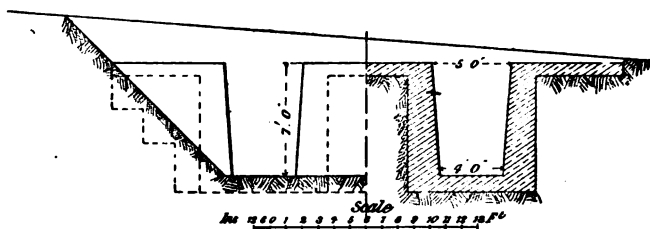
Half Elevation at End of Tunnel, and Half Cross-section through Tunnel.
